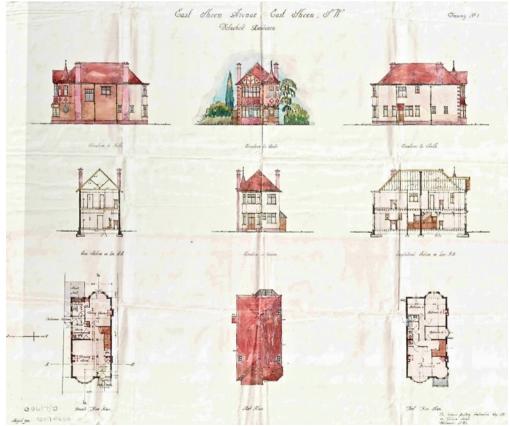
A graphically unusually elaborate building application drawing for a corner house, 1922, designed by the architects' department of the Improved Building Construction Company Ltd, 53 Victoria St, SW1 (Richmond Local Archive, PLA/02617).
